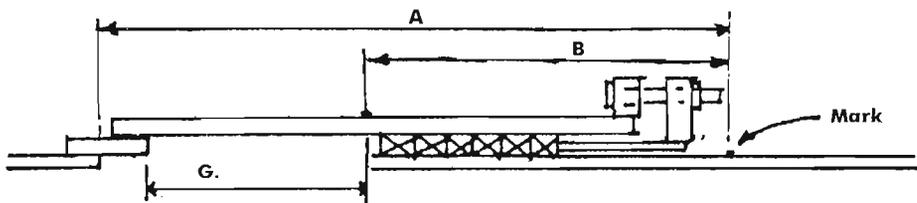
Setting the Gap in a Bolted Type Expansion Joint
